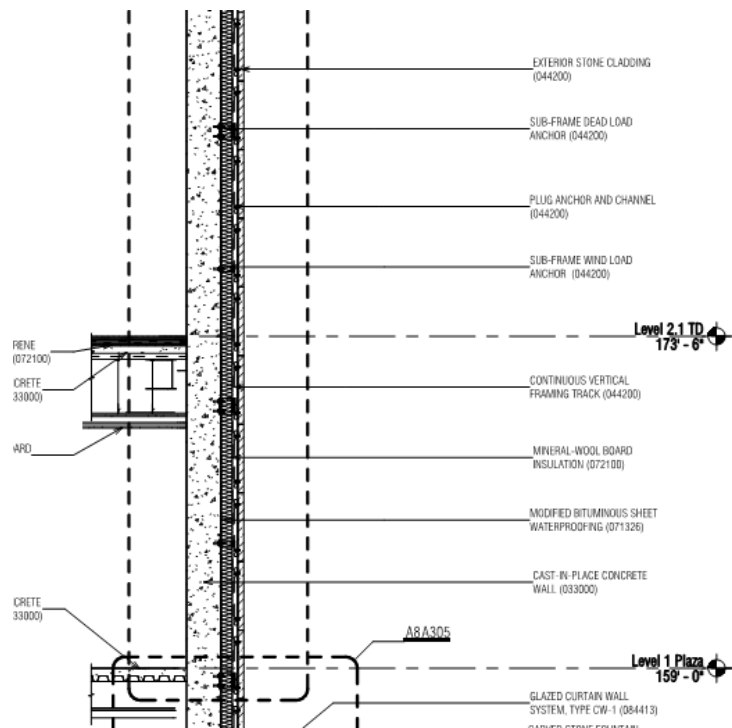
100% Contract Documents – Volume 6 – Turner Construction – Exterior Wall Sections – A300
